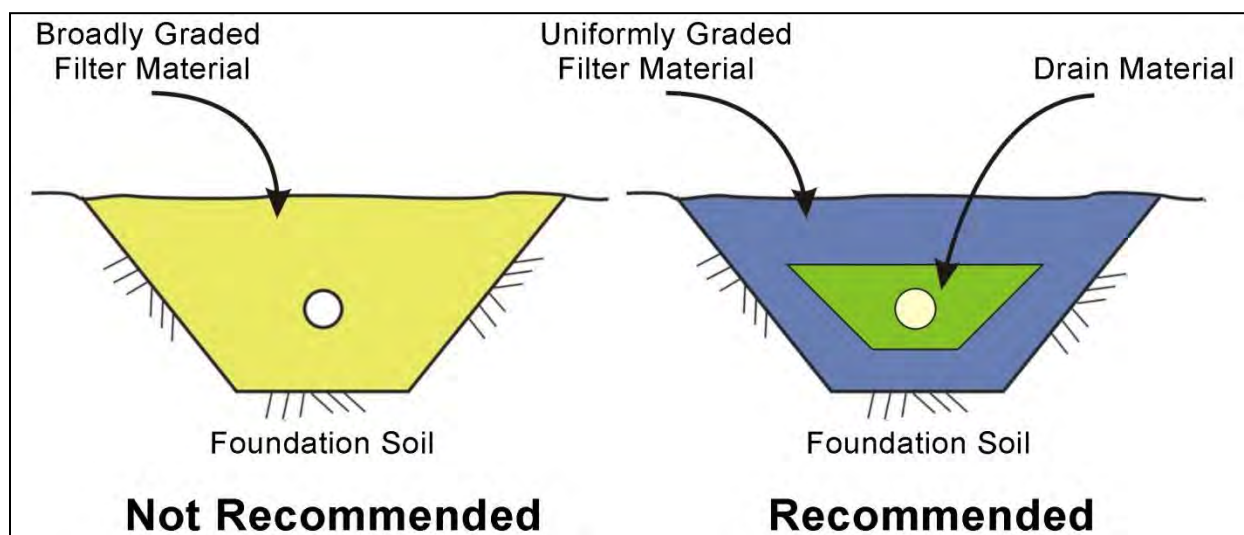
Typical one-stage (left) and two-stage (right) toe drains in a trapezoidal trench.
